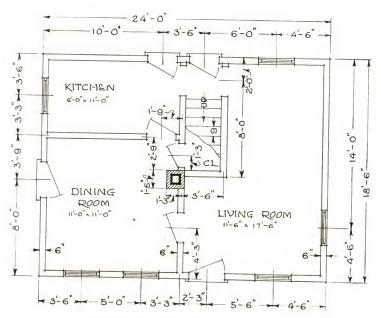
A. Typical Old House Before Remodeling Courtesy of U. S. Gypsum Company, Chicago, Ill.
